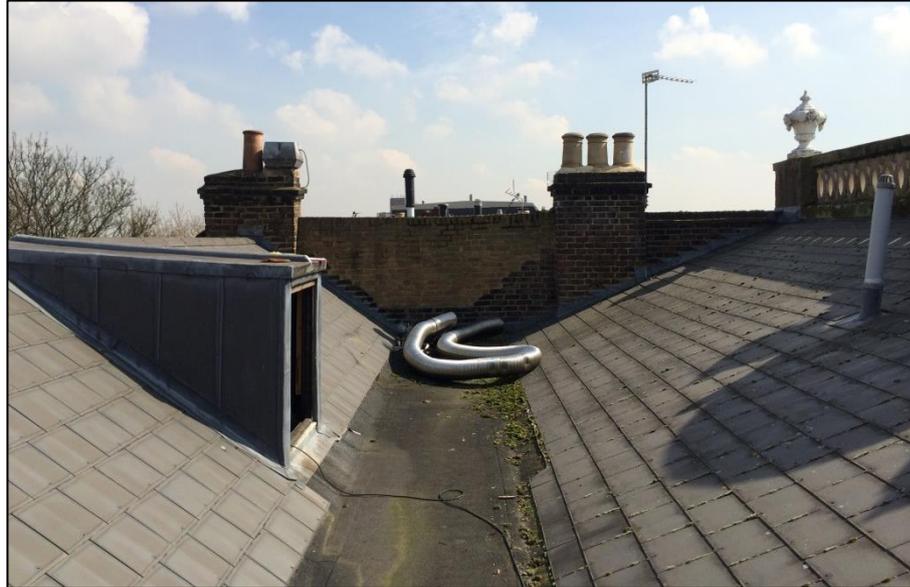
(above): View towards inside face of south façade and central asphalt sheeting roof gully showing 'modern' new build-up of the party wall with the adjacent property. This clearly shows cut bricks on a different angle to the current front roof suggesting an earlier roof has been replaced with the single slope leaning to the front parapet. The front roof form and fabric is therefore very unlikely to be original.
